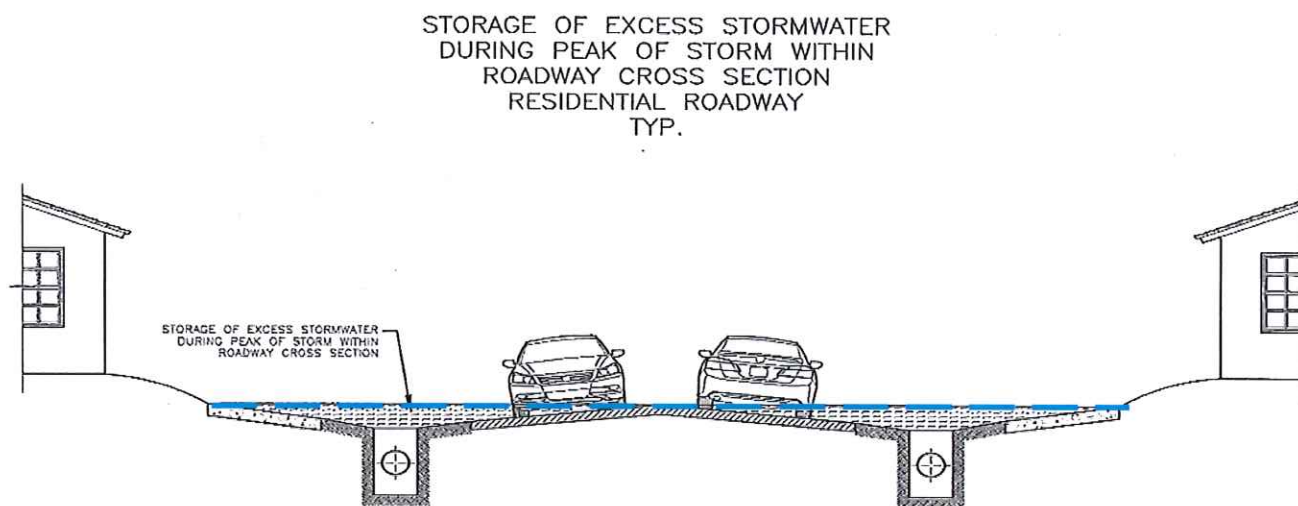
A flooded roadway stores excess runoff and protects neighboring houses.
